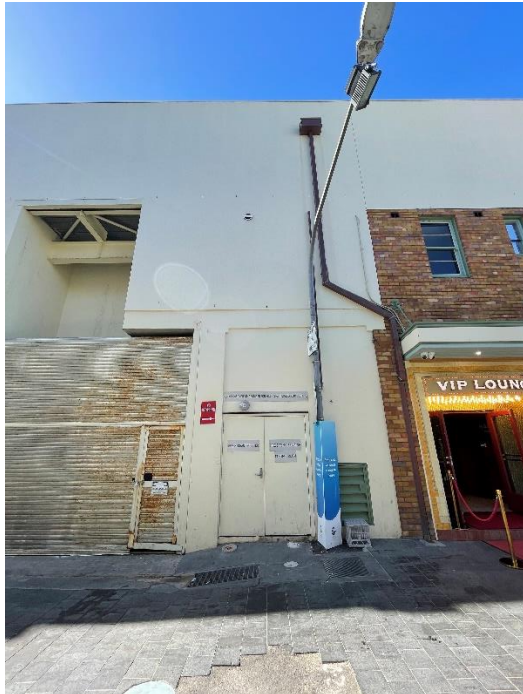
Part rear elevation of Hotel Steyne facing Henrietta Lane (Source: Squillace, 2023).
